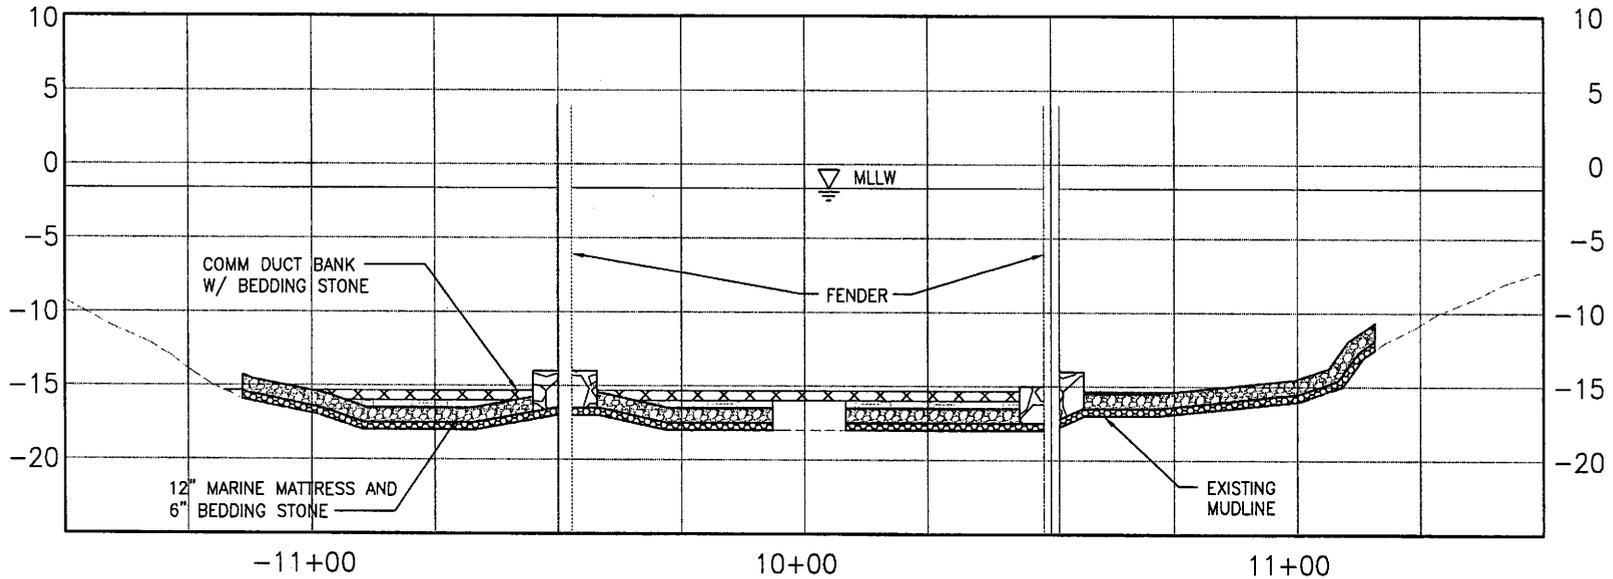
A HAULOVER CANAL BRIDGE EXSITING CONDITIONS PLAN
